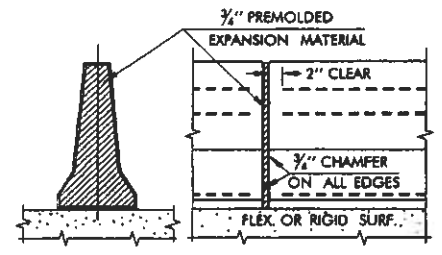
DETAIL OF TRANSITION SECTION AT BRIDGE ENDS
